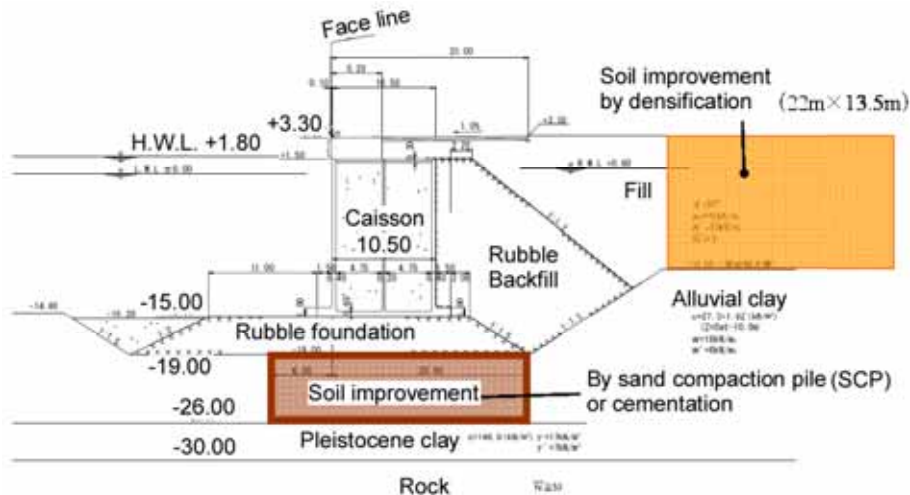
Cross section of a caisson quay wall considered for a design example
